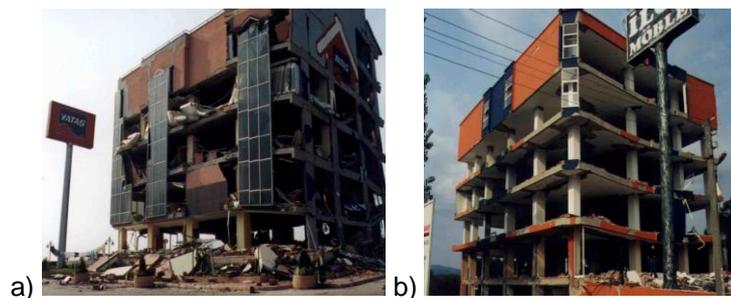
Showing (a) extensive damage in masonry infilled walls with no apparent distress in concrete frames (b) complete collapse of masonry infilled walls with some distress in first storey columns
